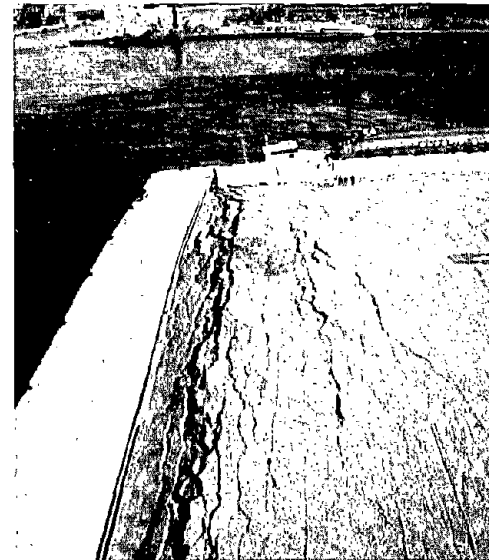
Note liquefaction induced lateral spread fissures and sporadic sand boils near pier of Nishihomiya bridge which previously supported collapsed freeway section.
